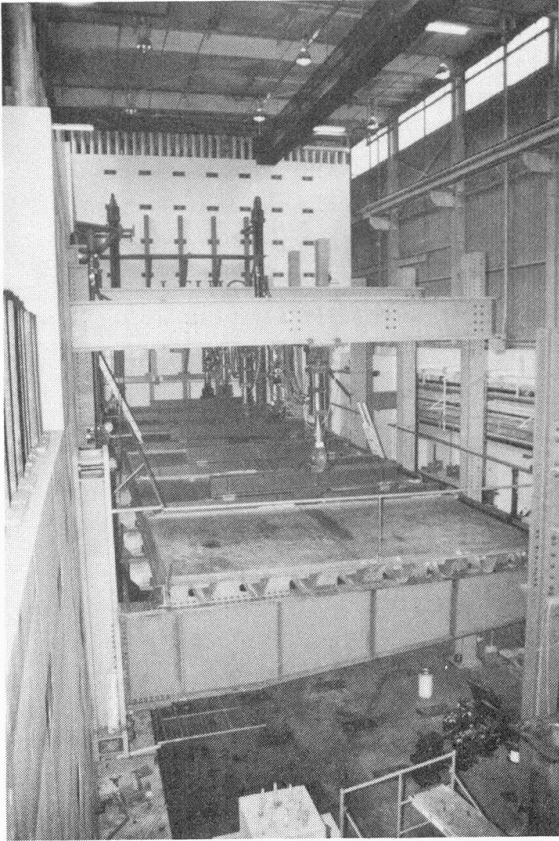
Full-scale fatigue test of a cantilevered section of an orthotropic deck.
